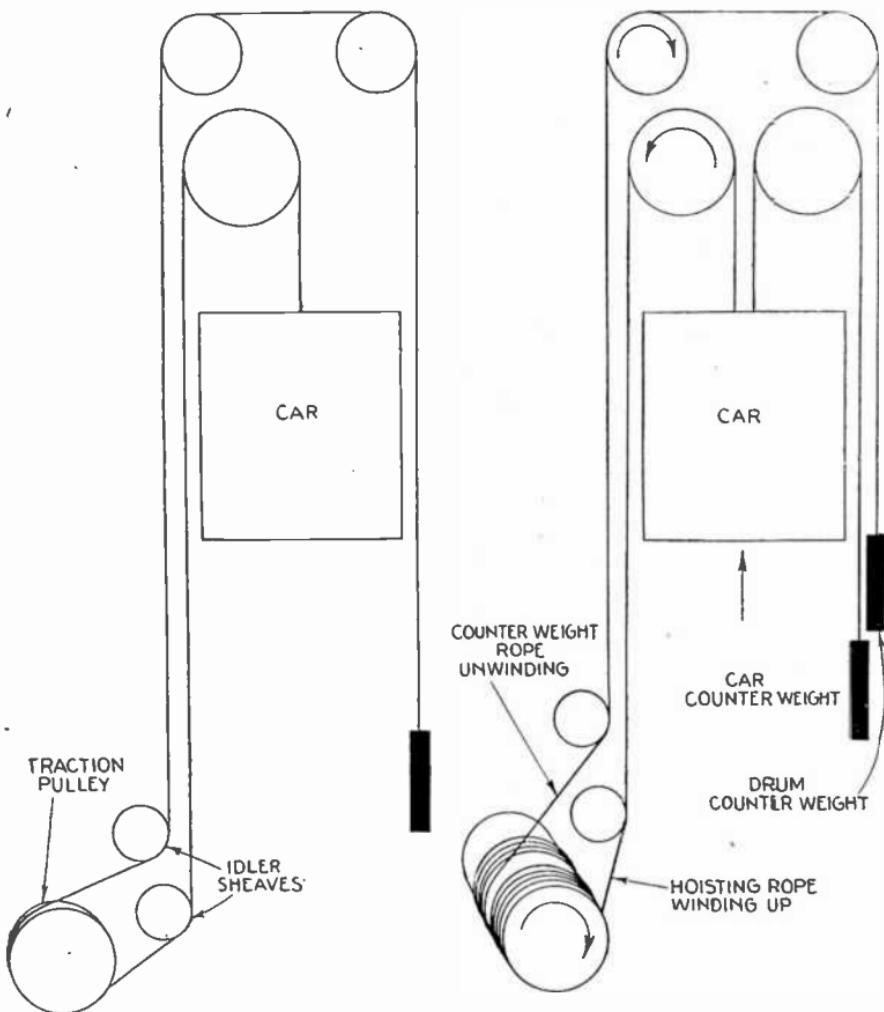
,745.—Rope drive arrangement for basement type V groove single traction elevator.
